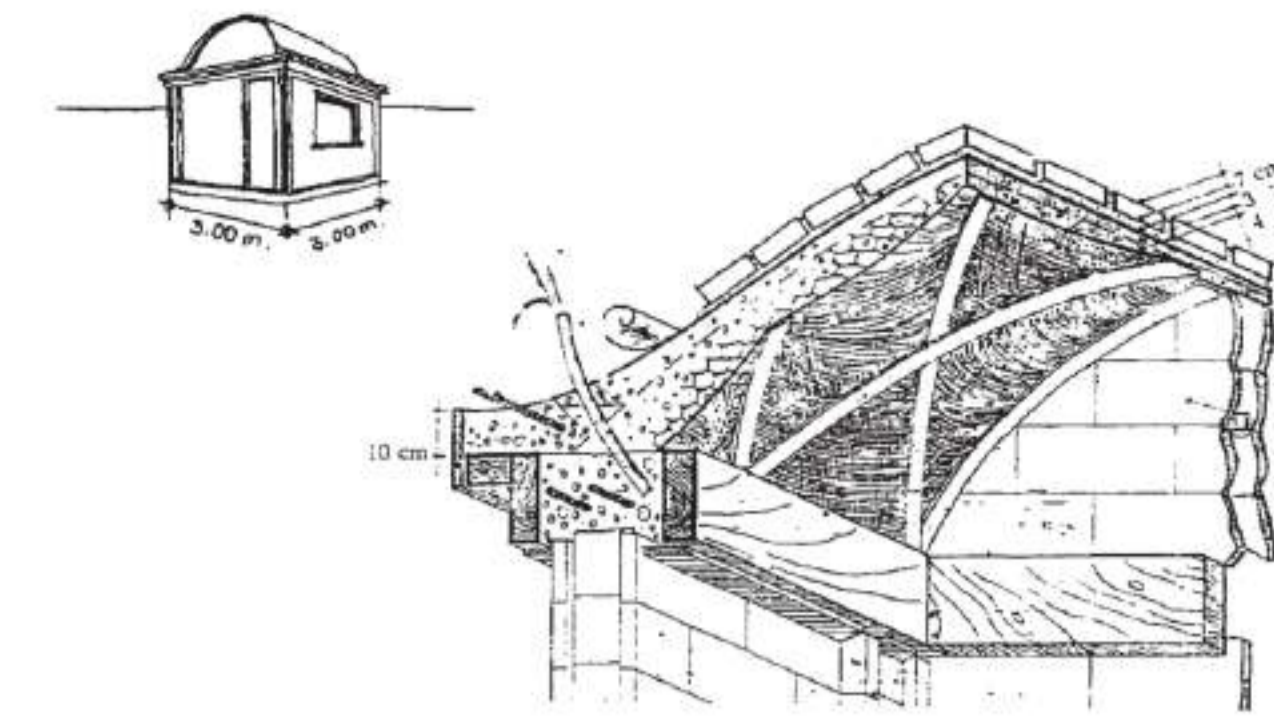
Roof structure of the Mexicali project houses (Yruegas, 1978)
